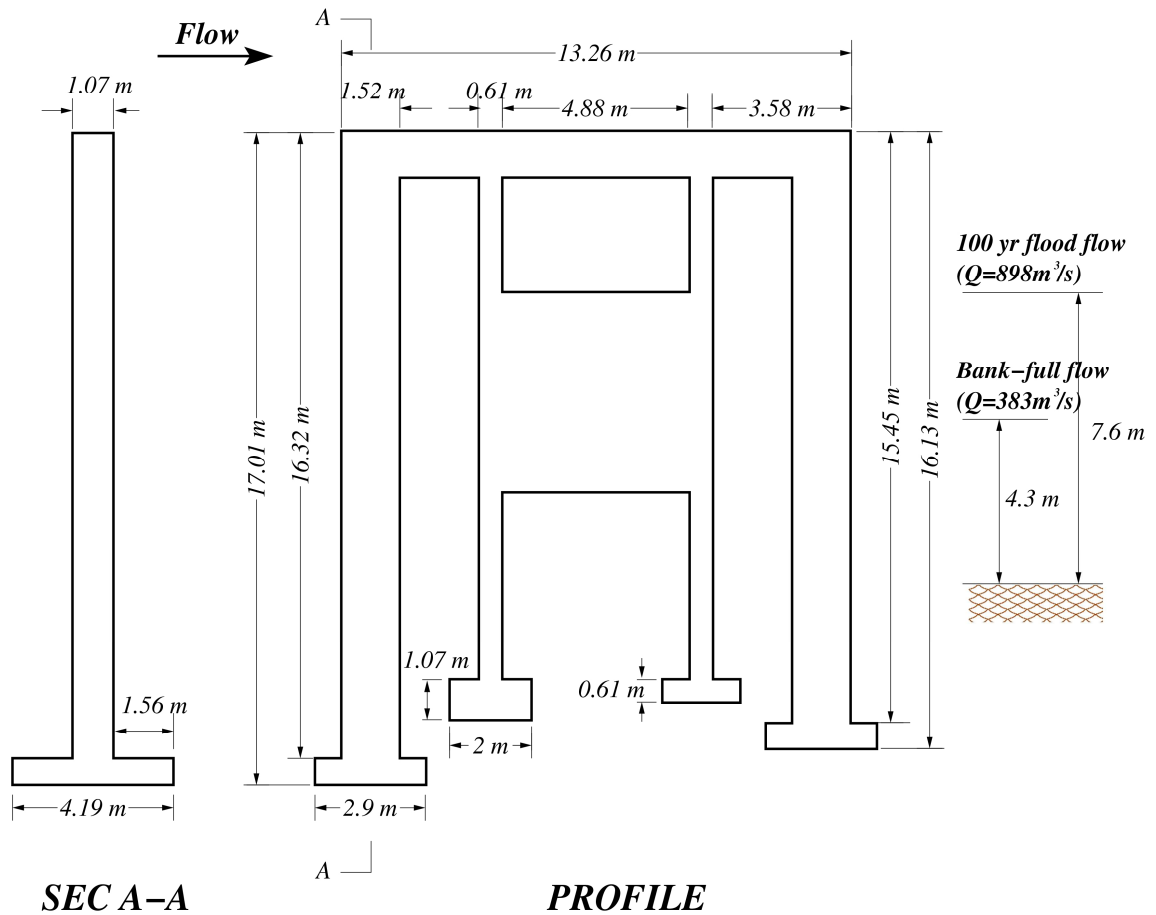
Schematic of central pier bent with prototype elevations and dimensions for Chattahoochee River bridge near Cornelia
